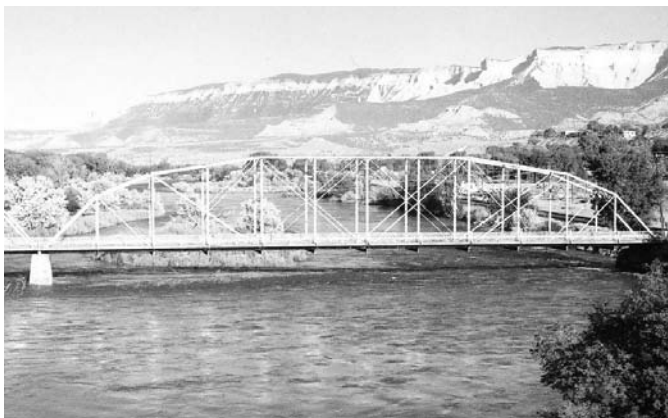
Rifle Bridge over the Colorado River at Rifle, Colorado. With a 240-foot (73-meter) span, this steel Pennsylvania truss, built in 1909, comprises the longer of two different spans at that location. The deck is similar to that at Prowers: steel floor beams with steel stringers, covered by a corrugated-metal deck with asphalt pavement.
